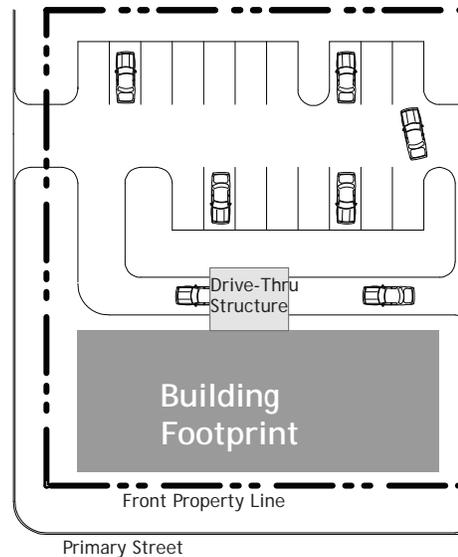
(6) Recommended Drive-Through Facility Layout
